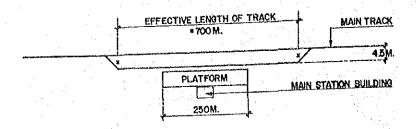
TRACK LAYOUT OF INTERMEDIATE STATION
